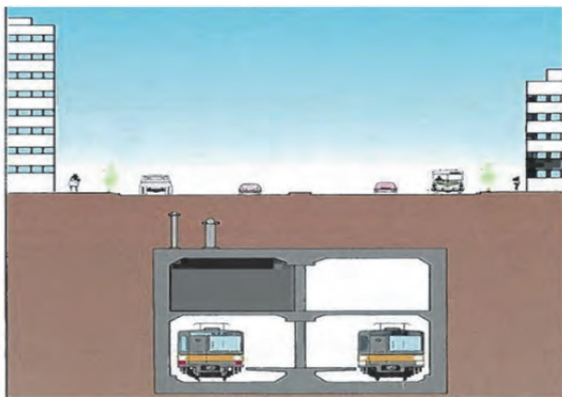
Underground Station by cut and cover Fig. 13.2 Shield Tunnel between Stations by TBM
